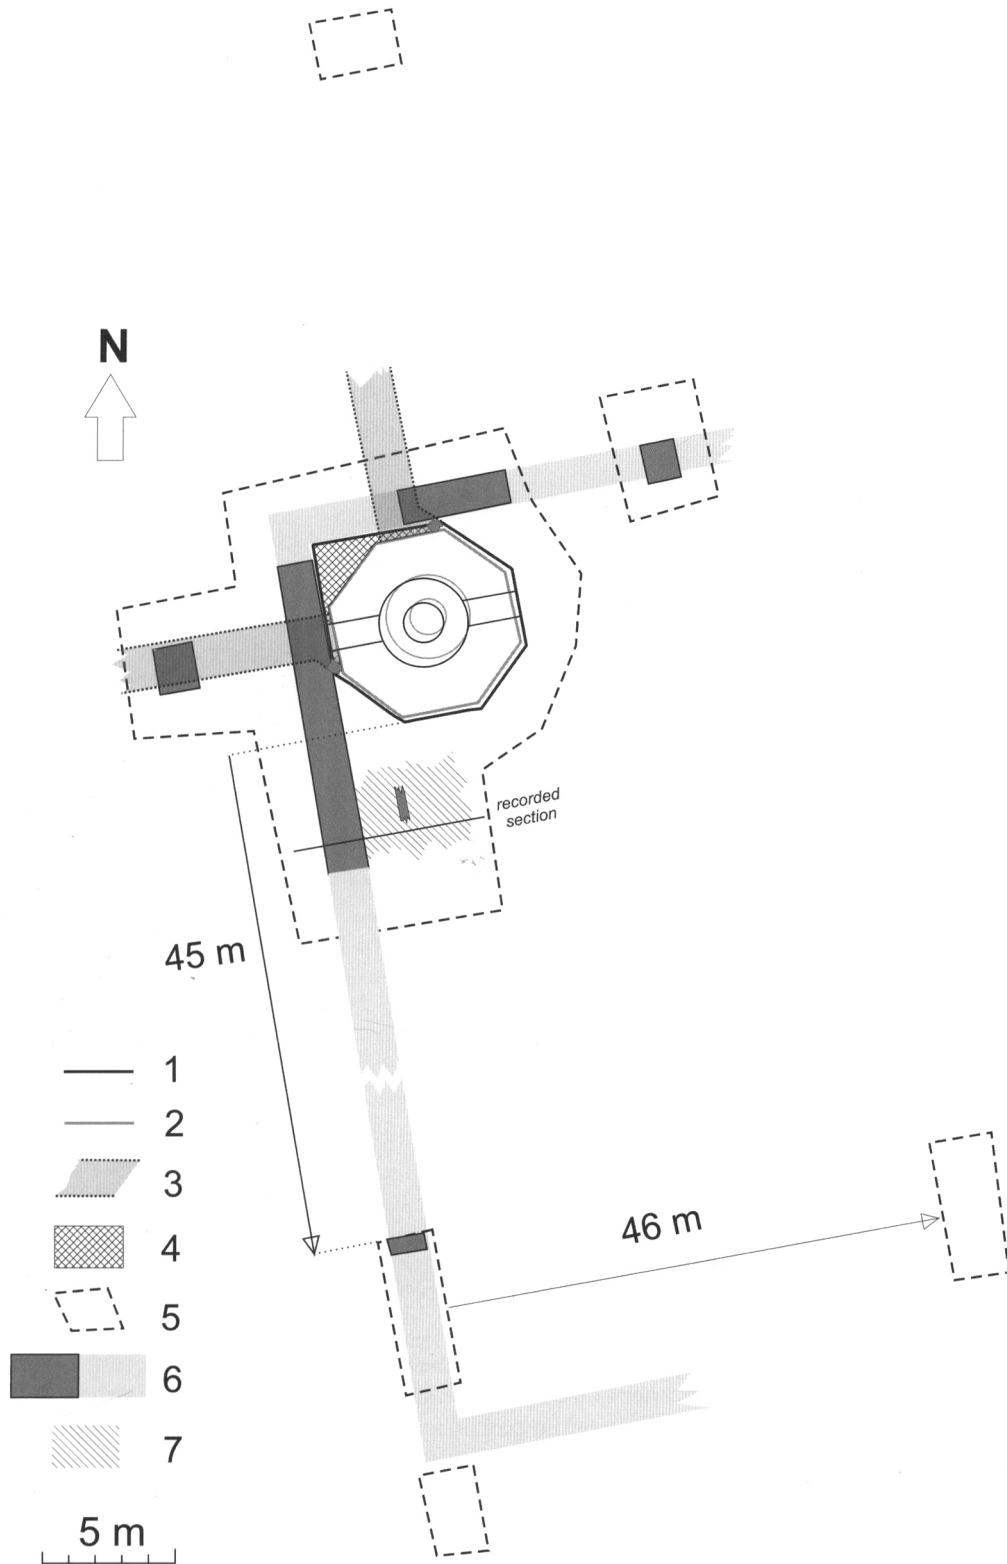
Arbīl, the Čoli Minaret, groundplan with structures unearthed in 1960–62 and reconstruction of the adjacent structure: 1 – groundplan of the minaret’s base, 2 – groundplan in the level of the entrance from a roof, 3 – conjectural plan of the *madrasa’s* (?) perimeter walls, 4 – the additional support, 5 – excavated areas, 6 – the wall foundations both unearthed and conjectural, 7 – pavement (drawing by K. Nováček, sources: Husayn 1962, plan of minaret provided by Gema Art Group, Prague).
